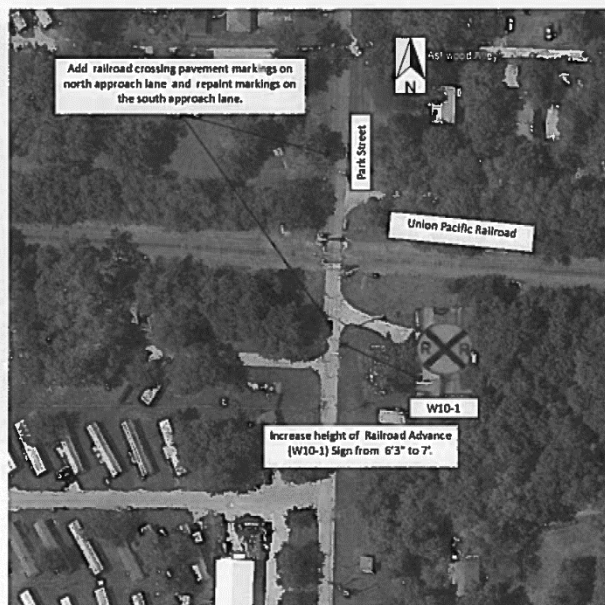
Low-cost recommendations at Railroad & Park Street crossing
